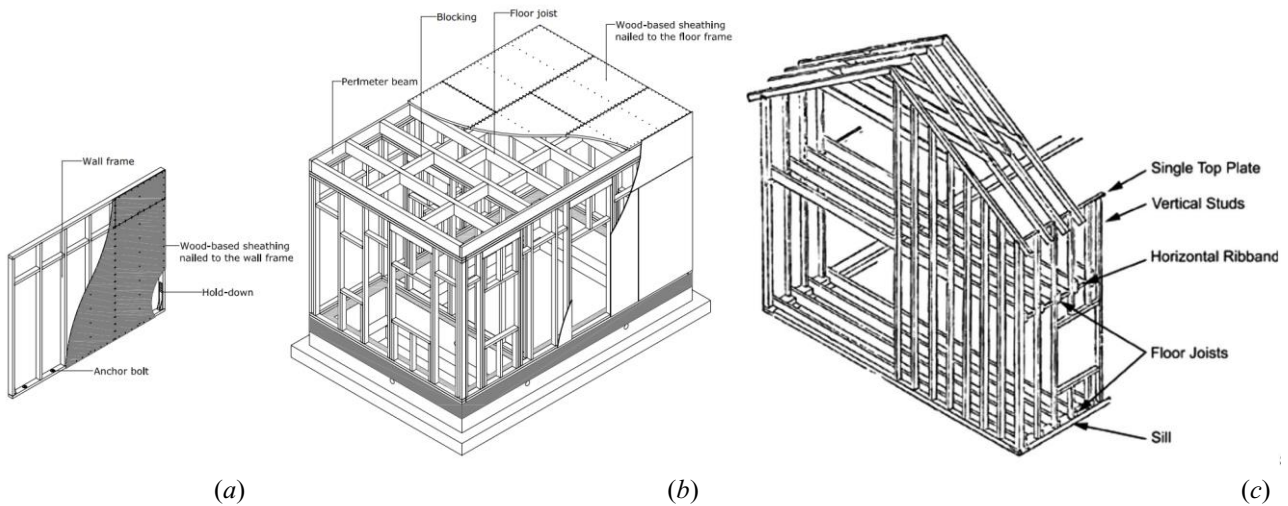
Light timber frame system: (a) wall components, (b) platform frame structure and (c) balloon frame structure (image credits: (a-b) Follesa *et al.* [36] and (c) Acar [37]).
